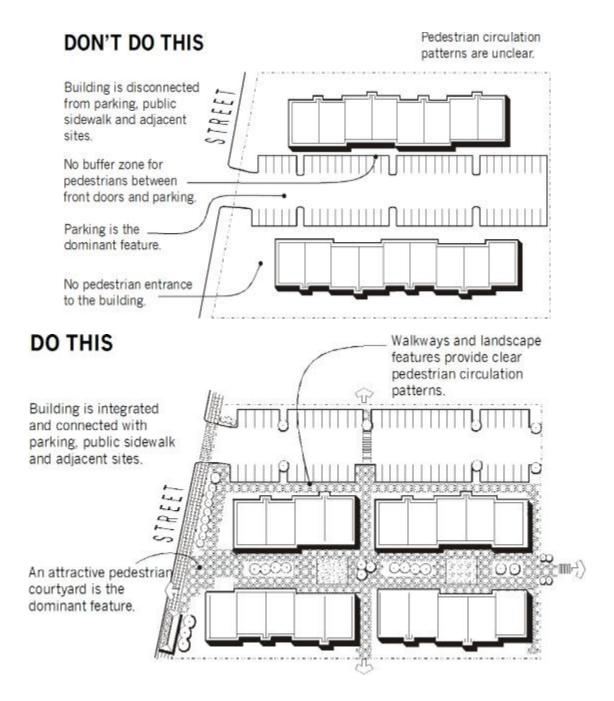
(D): Avoid parking that dominates the site. Encourage parking located behind or on the side of buildings and common open space between buildings.
